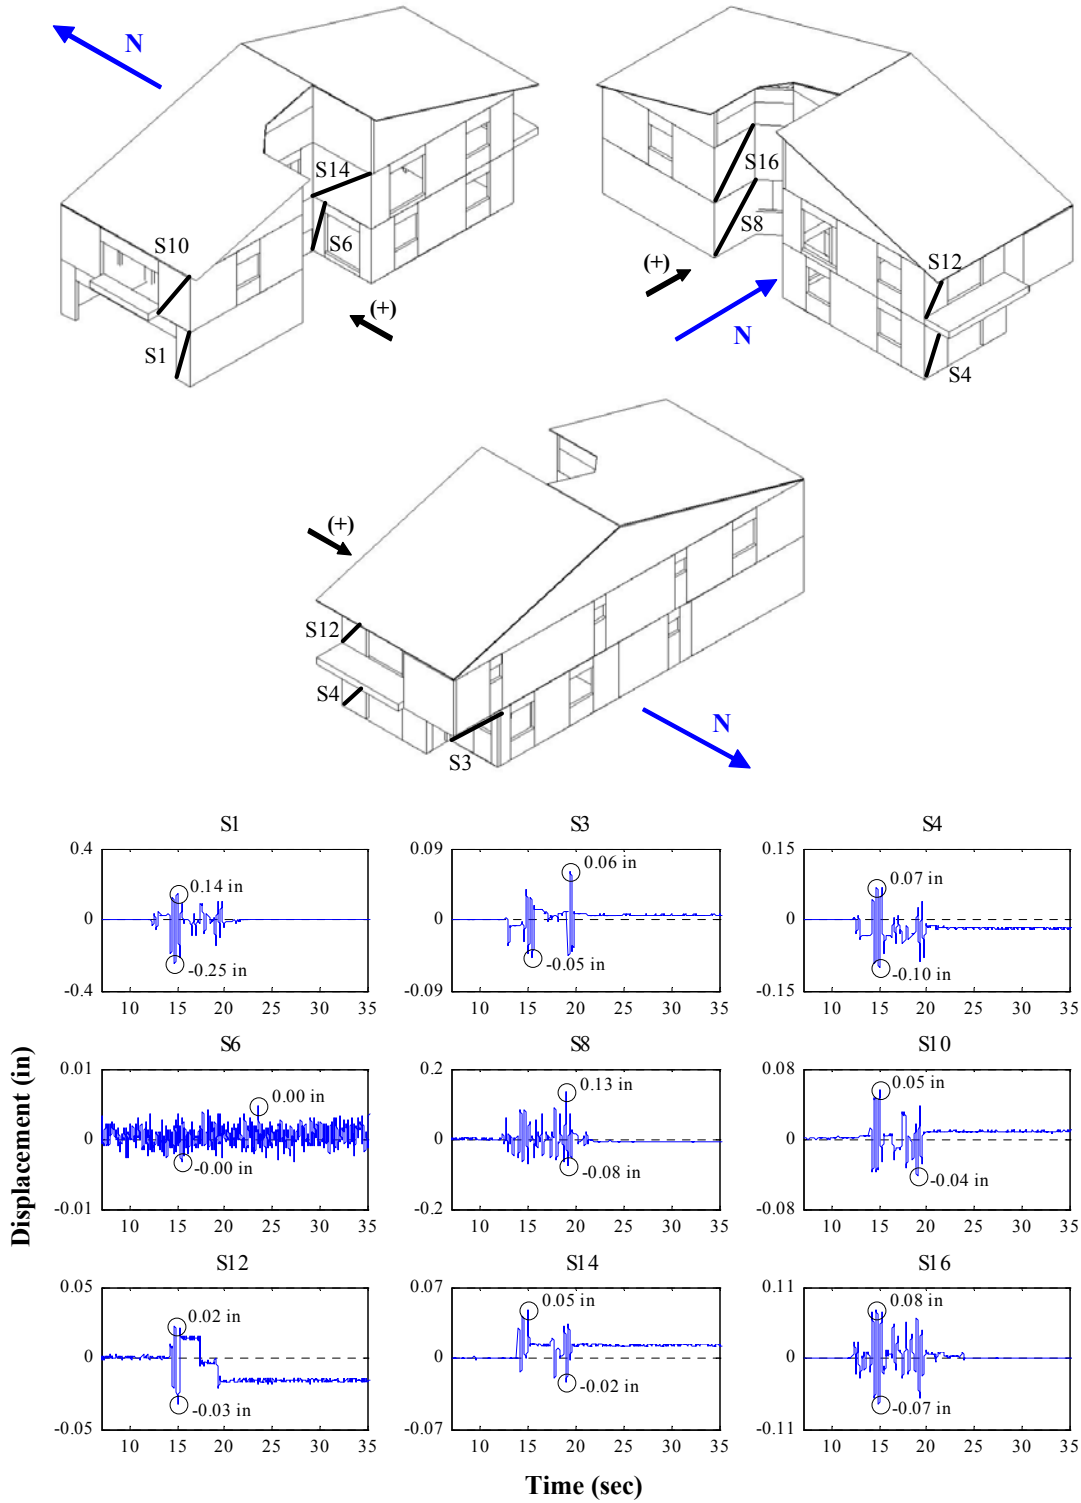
Wall deformations of north-south external walls for Test NWP1S10
